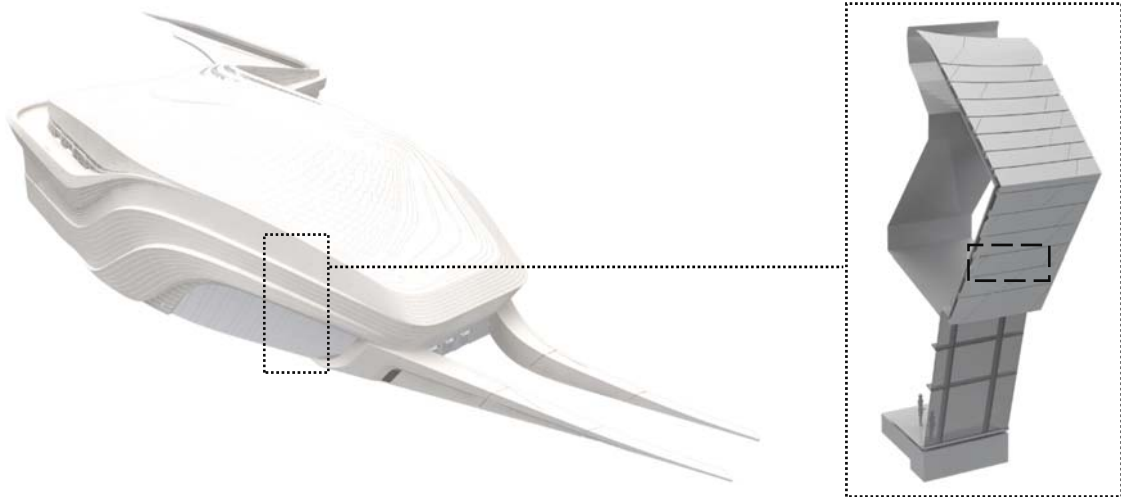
Assonometric view of the whole building (left) and typical bay (right)
